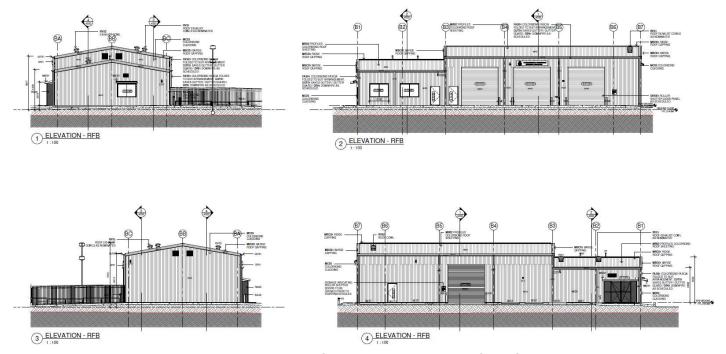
Rural Fire Brigade Station Elevations (NBRS, 28 September 2023)
